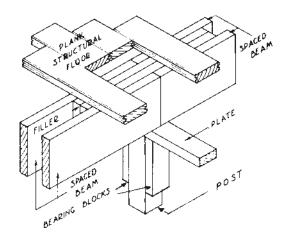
Roof Beam and Spaced Floor Beam Bearing at Exterior Wall
